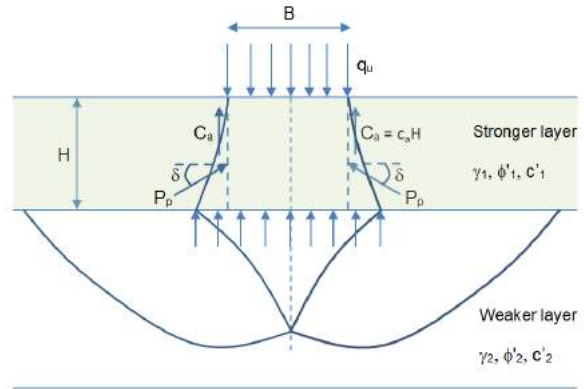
Failure mechanism of two-layer soil below footing on top of strong soil
